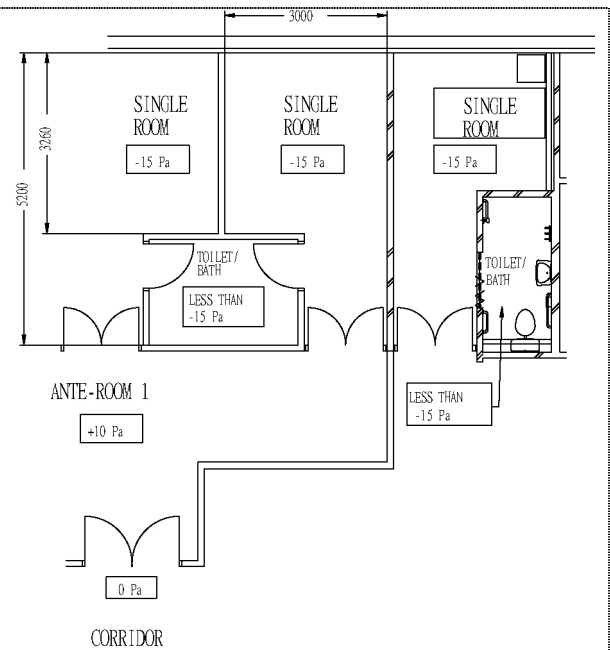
AN EXISTING LAYOUT OF SEMI-SUITE
